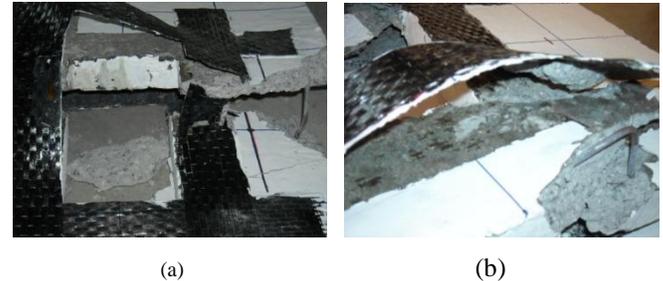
Failure mode of wall panels with openings strengthened with CFRP pattern 1 in tension face.
